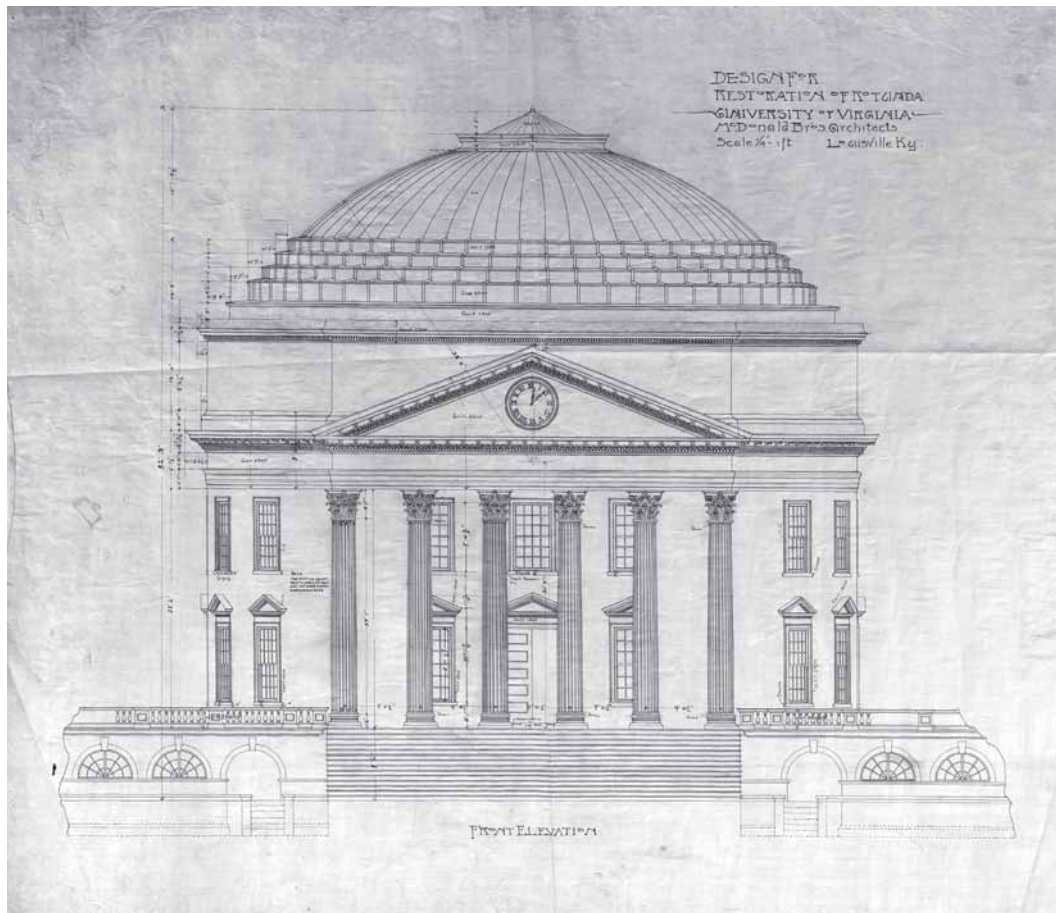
McDonald Brothers drawing for the restoration of the south elevation. [Special Collections, UVA]
